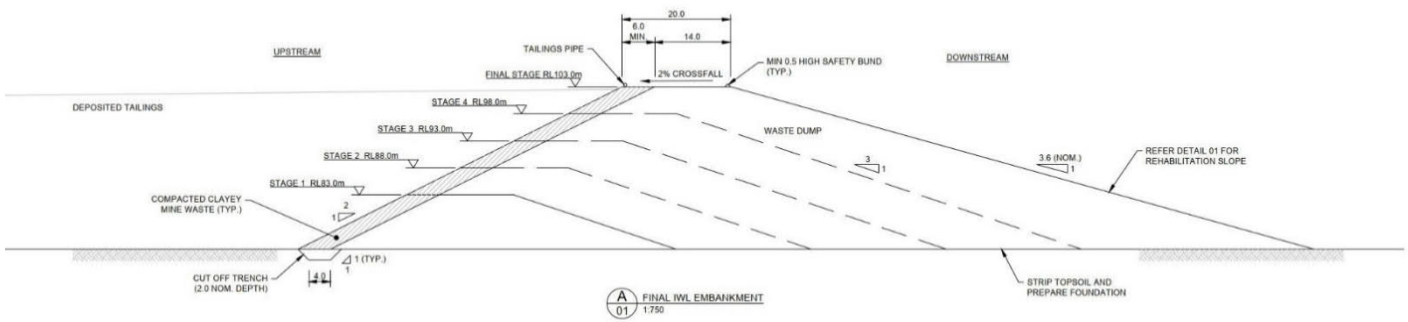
A: Typical Cross Section TSF Perimeter Embankment
